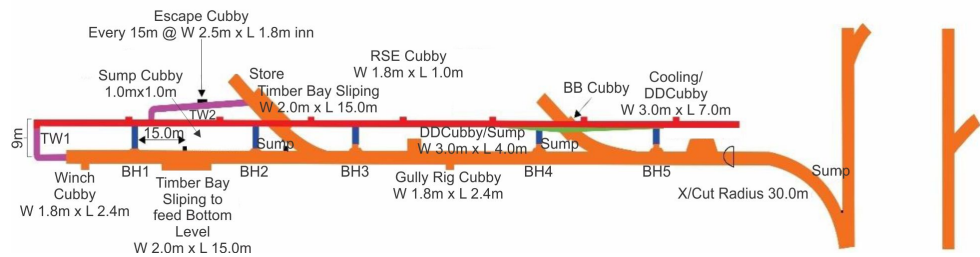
Section of a Typical Footwall Crosscut at Mponeng
